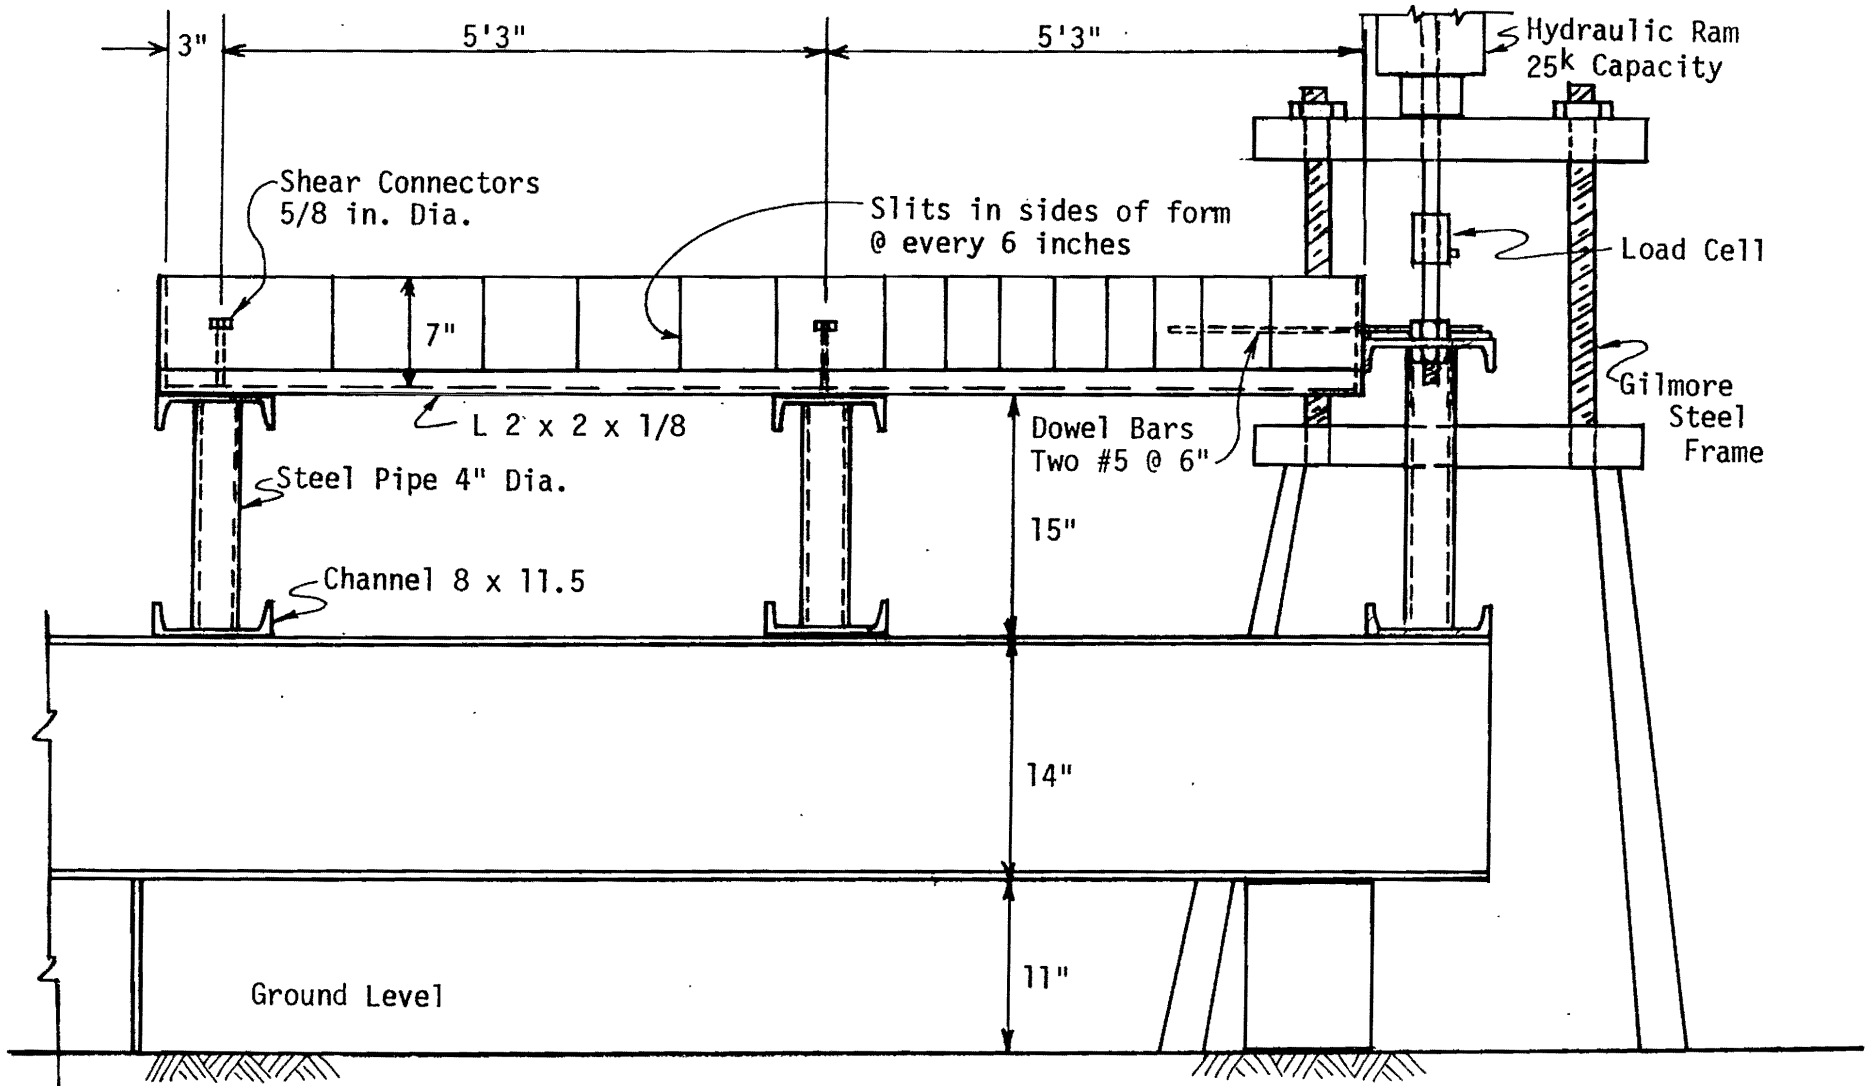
Side Elevation of Loading Frame and Test Specimen Details.
